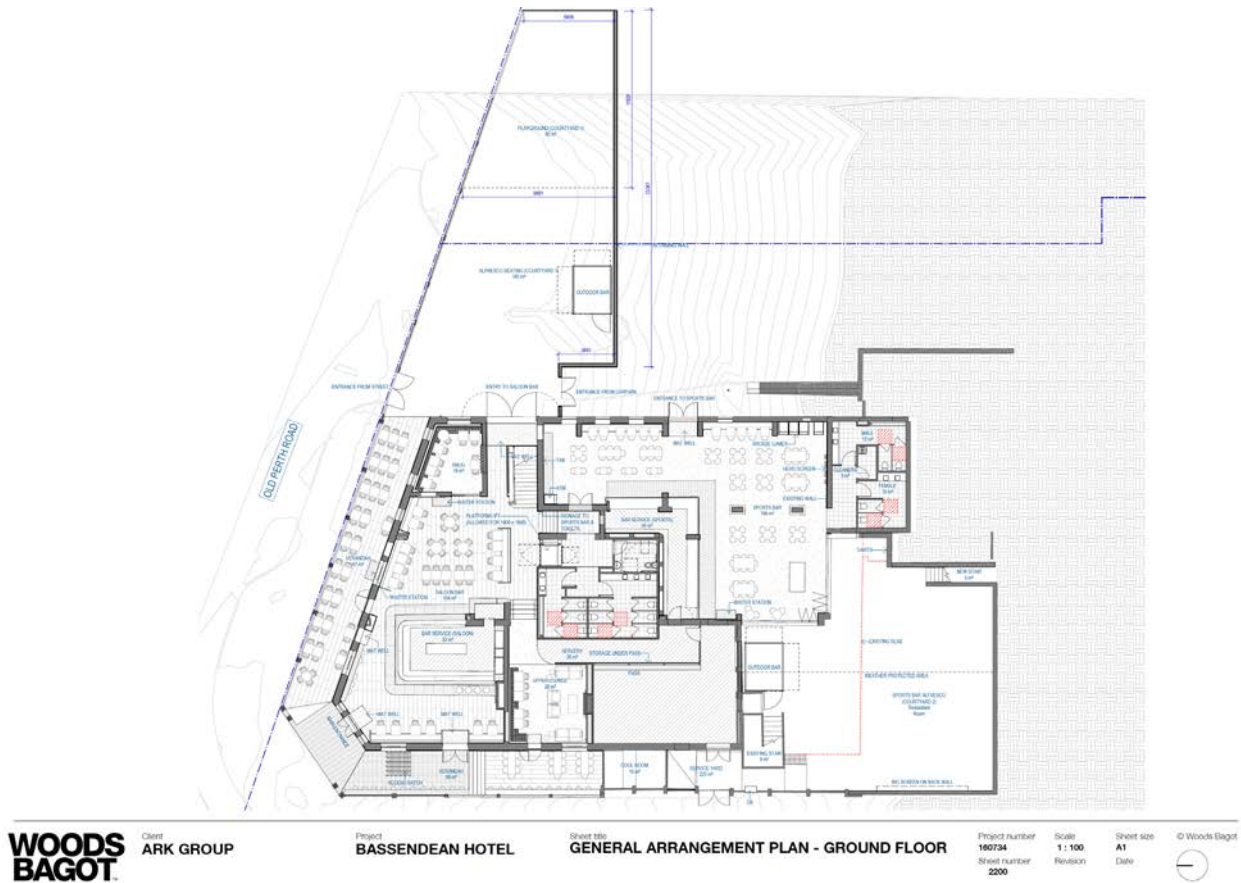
Excerpt from the General Arrangement – Ground Floor Plan. (Client, 26 November 2020).
